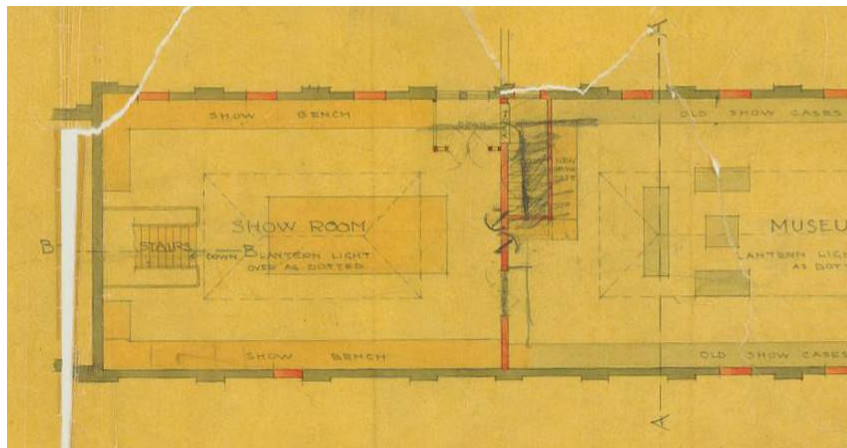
The first floor of Building A. The new Showroom and planned Museum is beyond and above the Slip House (source: Worcester Porcelain Museum).
